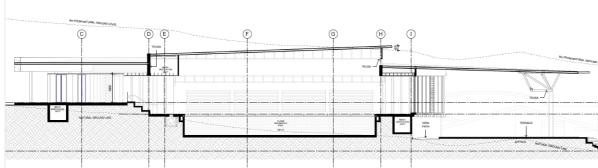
Extract of Cross Section (prepared by NBRS Architecture)
